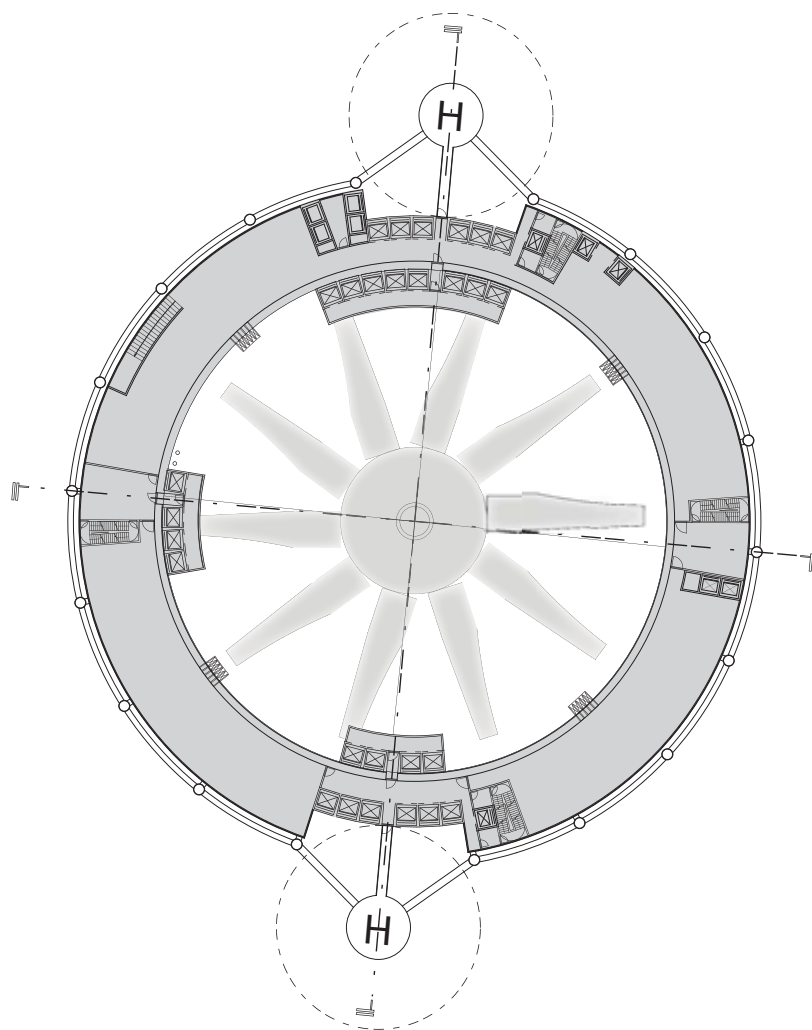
Krafthaus typical floor plan. © Thomas Kraubitz
